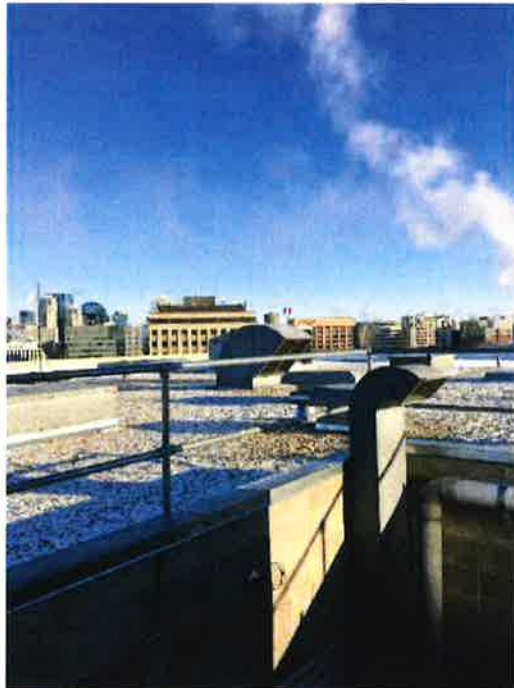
Roof showing exhaust outlet and intake separation near cooling tower well
